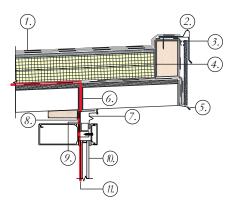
Example Horizontal NLT Roof Assembly to Soffit Transition Detail at Window Head
